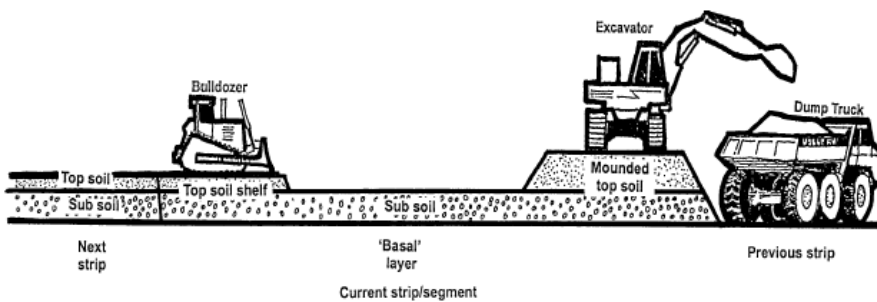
Soil stripping with bulldozers and dump trucks: Topsoil
